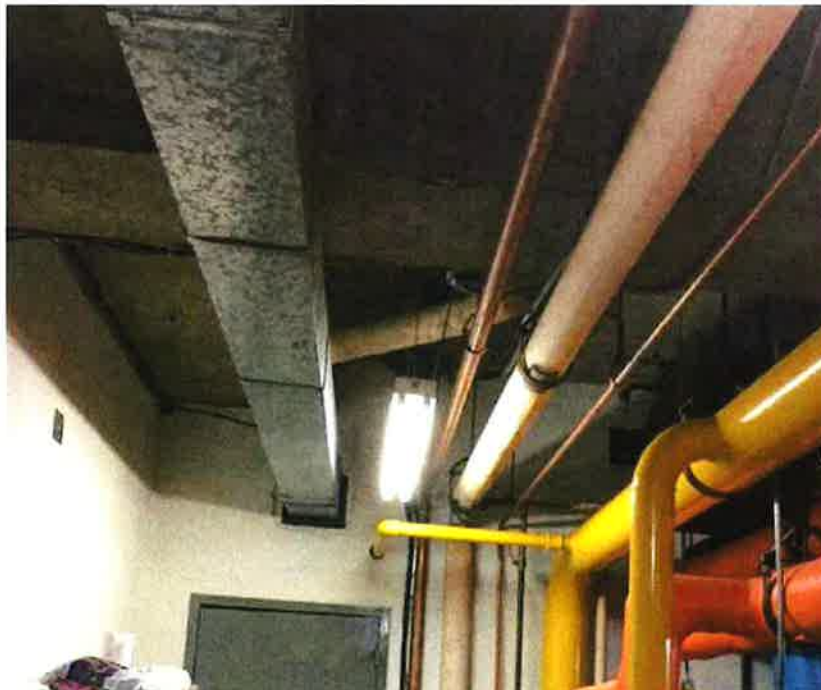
Uninsulated copper domestic hot water piping in ceiling of mechanical room
